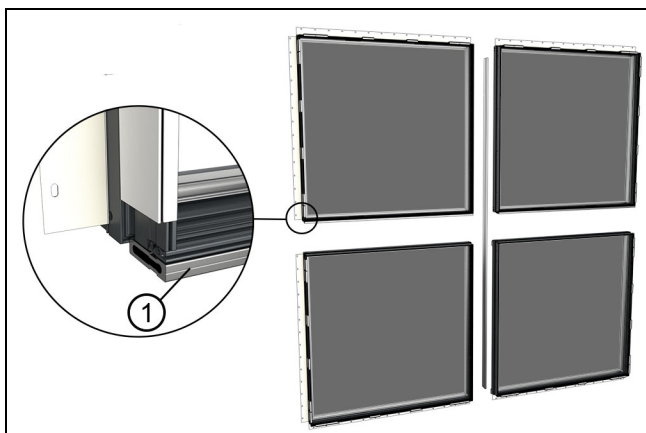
Horizontal mull (framing not shown for illustrative purpose)
